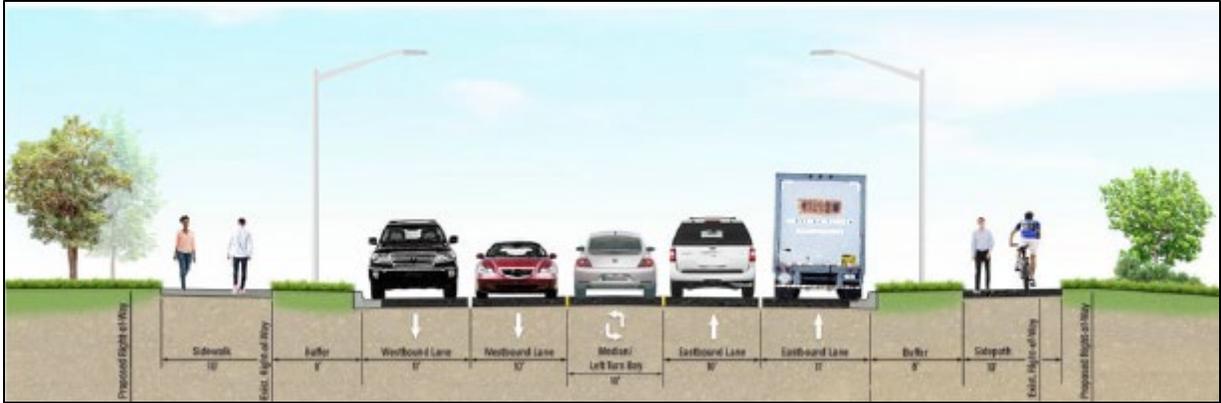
Alternative 4 – Old Columbia Pike Typical Cross Section
